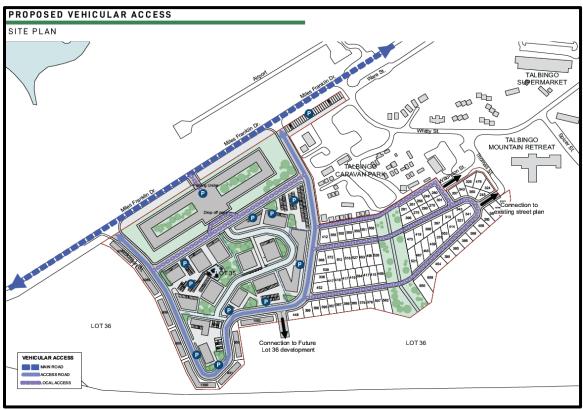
Vehicular Access (Source: Robert Harwood Architects)
